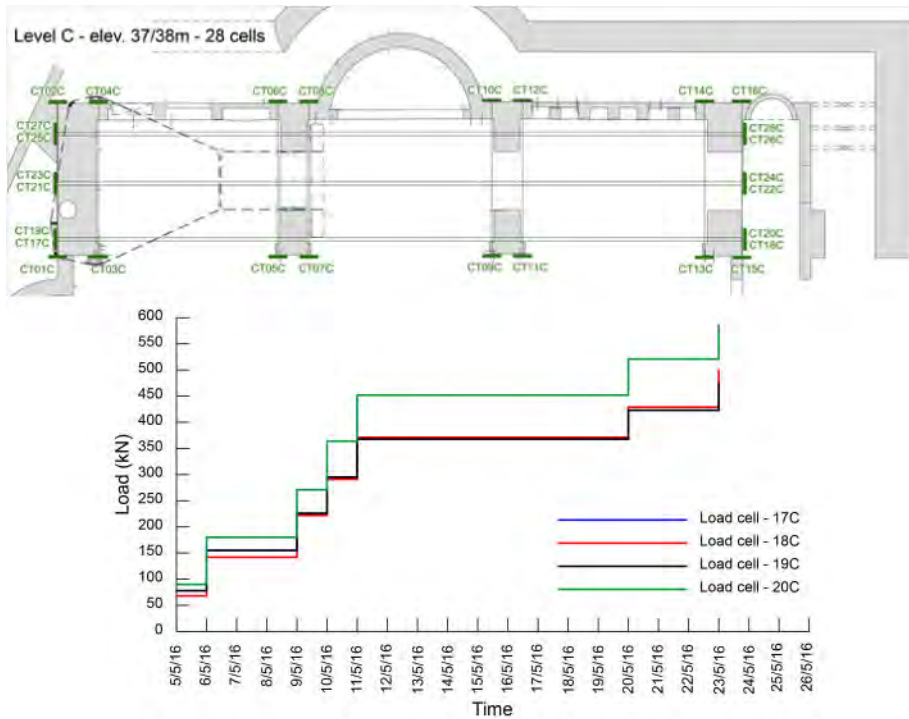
Plan view of the installed load cells and loading steps in the upper and inner chain (level C).
